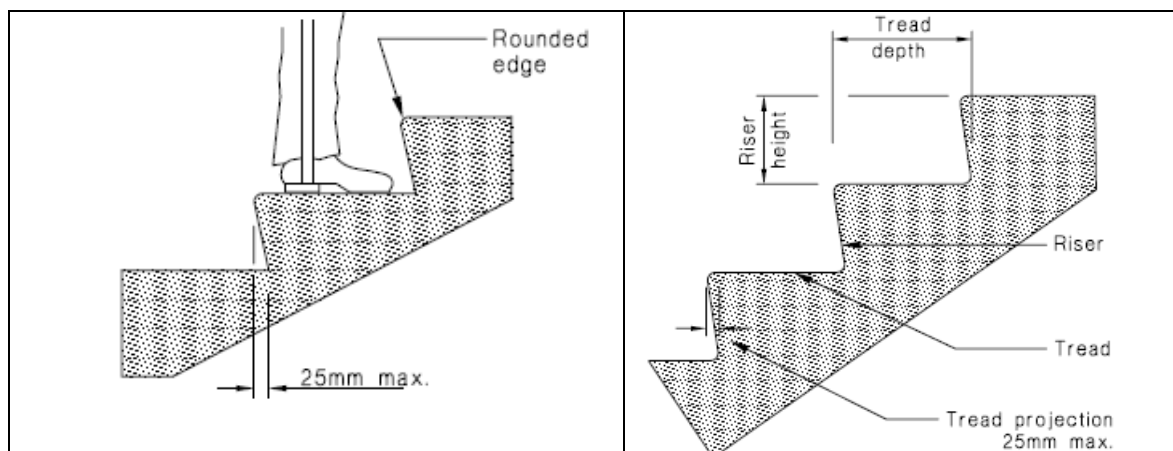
Further details of accessible steps (source: NZ Building Code 2007)
